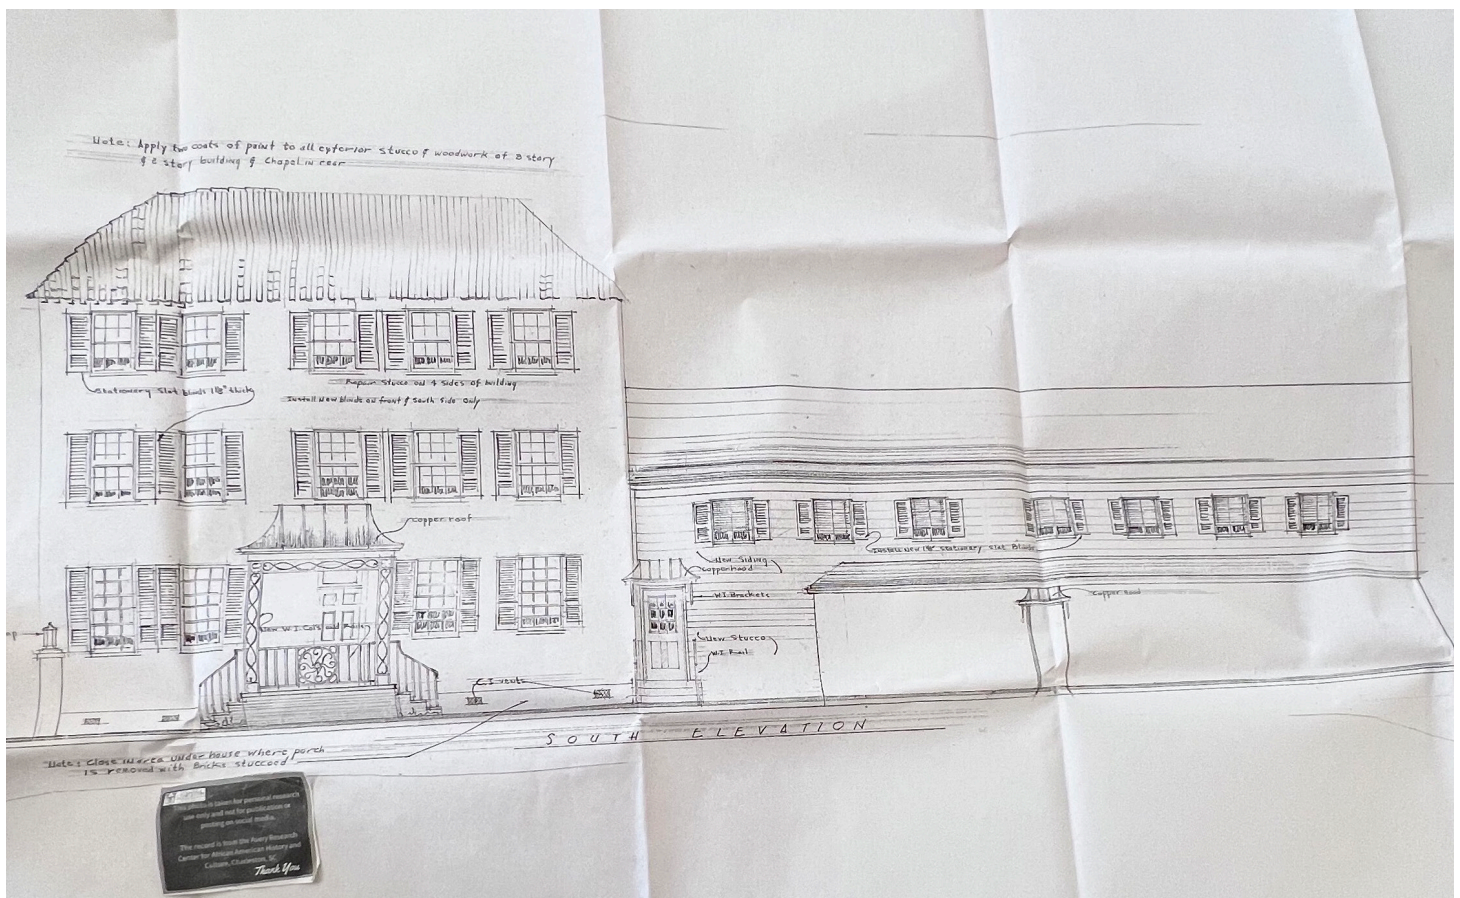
1953 renovation plans for No. 122 Logan Street by DeCosta (Avery Research Center)
